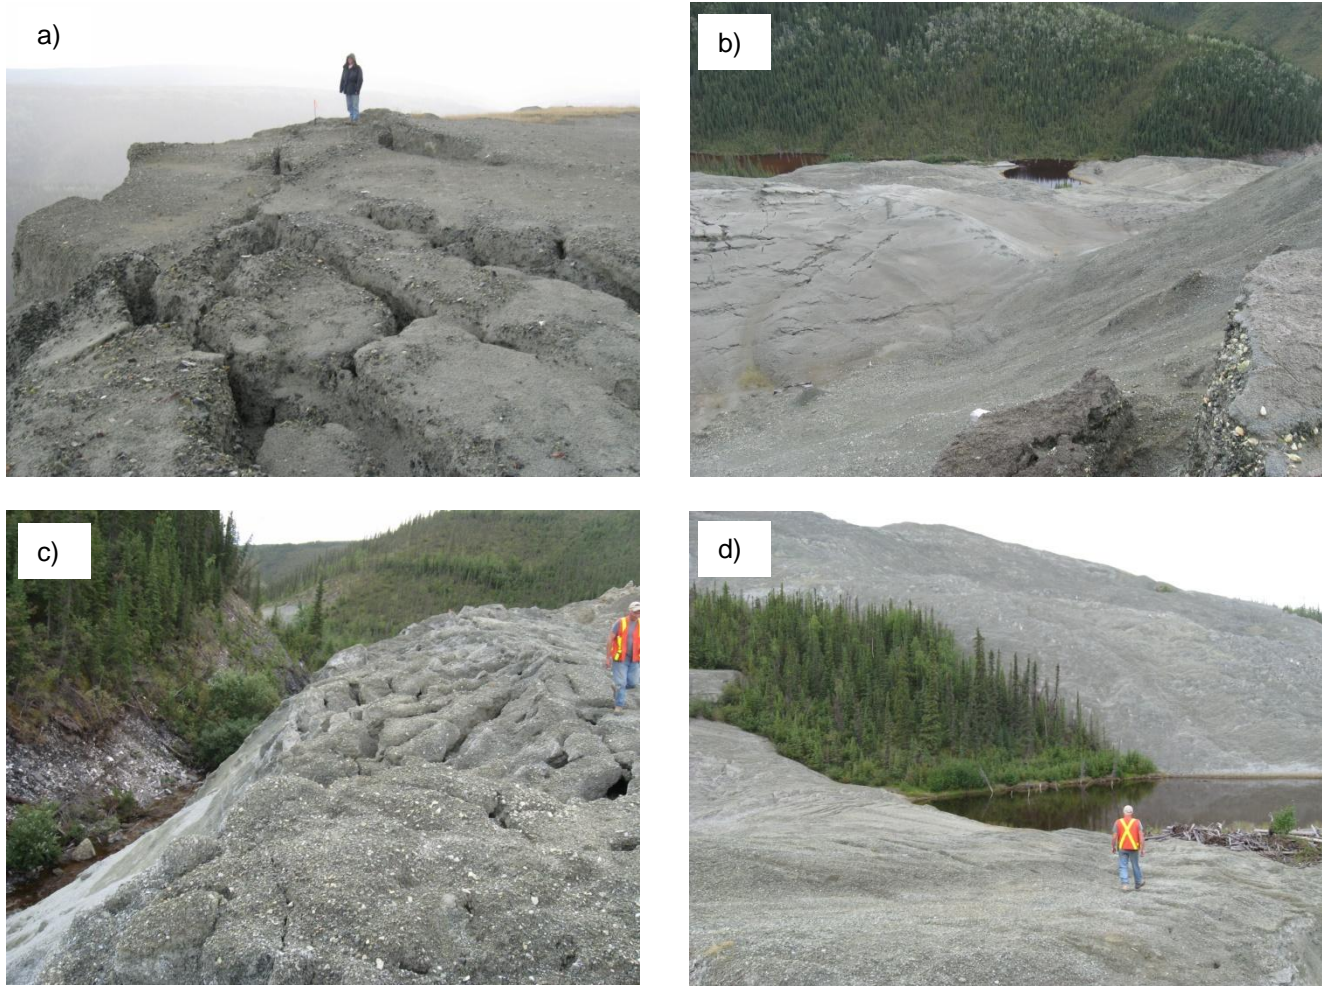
a) Tension cracks at top of tailings pile; b) Tailings and ponds at toe of tailing viewed from top of tailings; c) North edge of south tailings lobe; d) Pond between tailings lobes, looking north
